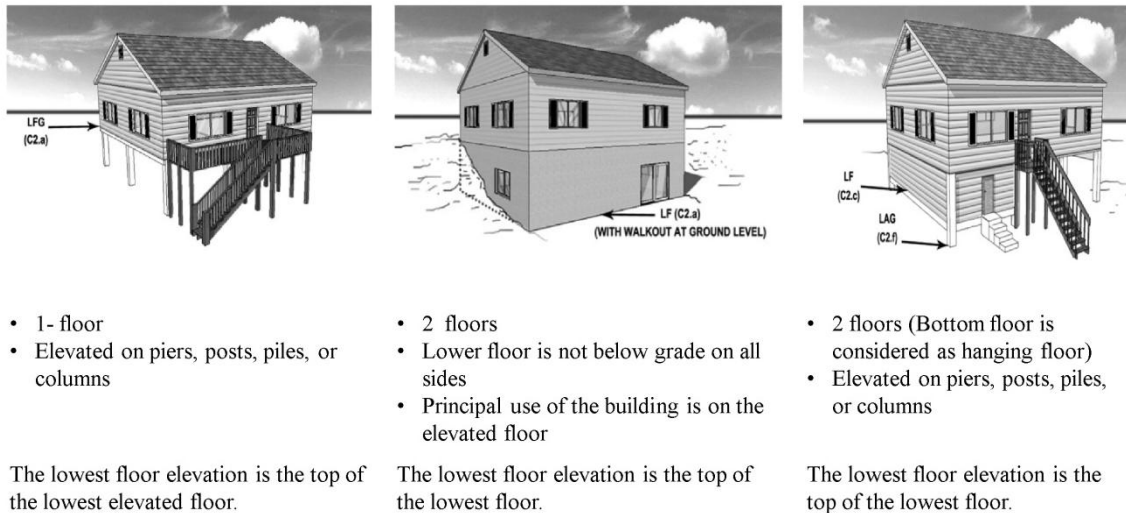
Example Photographs of Lowest Floor Elevation for Elevated Structure (FEMA, 2011a)
